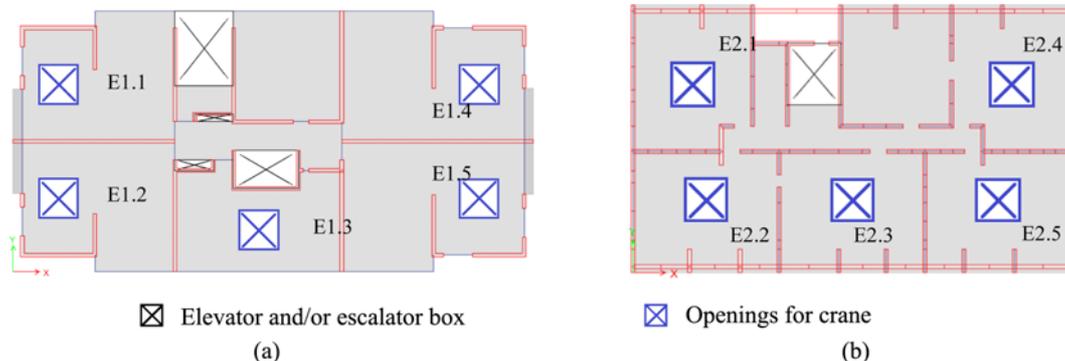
Openings' Location of Tower Crane: (a) Openings' Location of Tower Crane for Type A Building, (b) Openings' Location of Tower Crane for Type B Building
